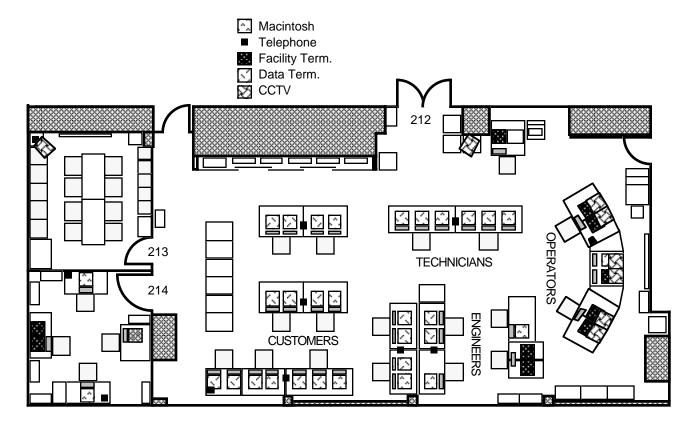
12ft Pressure Wind Tunnel Control Room Layout
